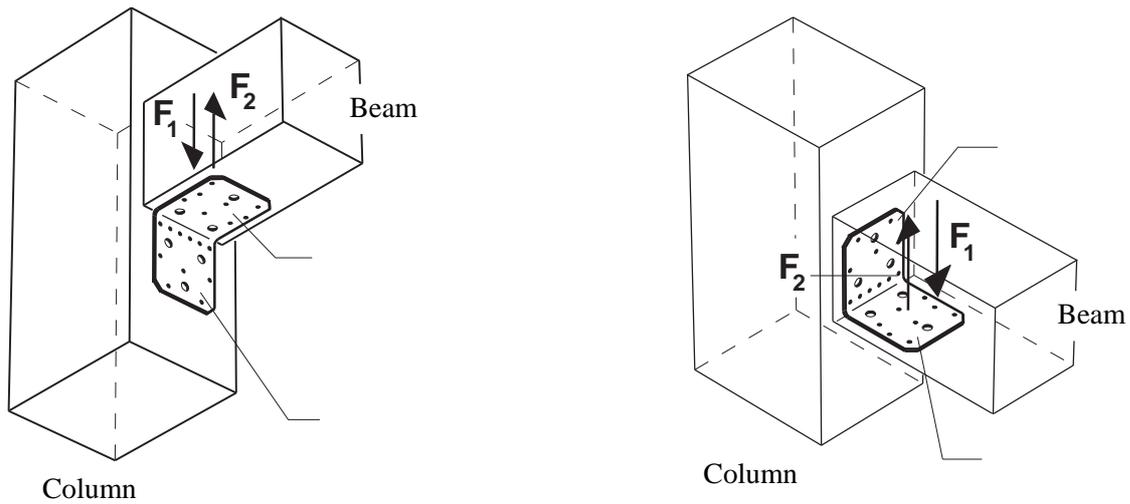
Beam to column connection – Angle bracket with a rib
